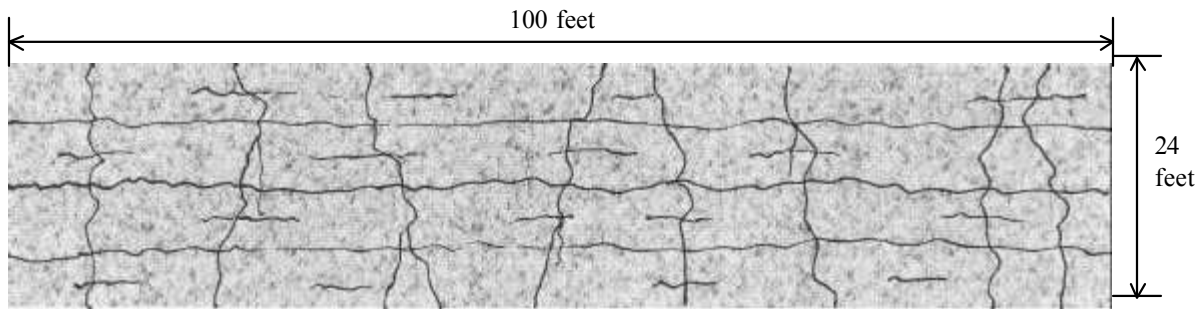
2,400 ft² Section of Roadway with about 300 Feet of Cracking
